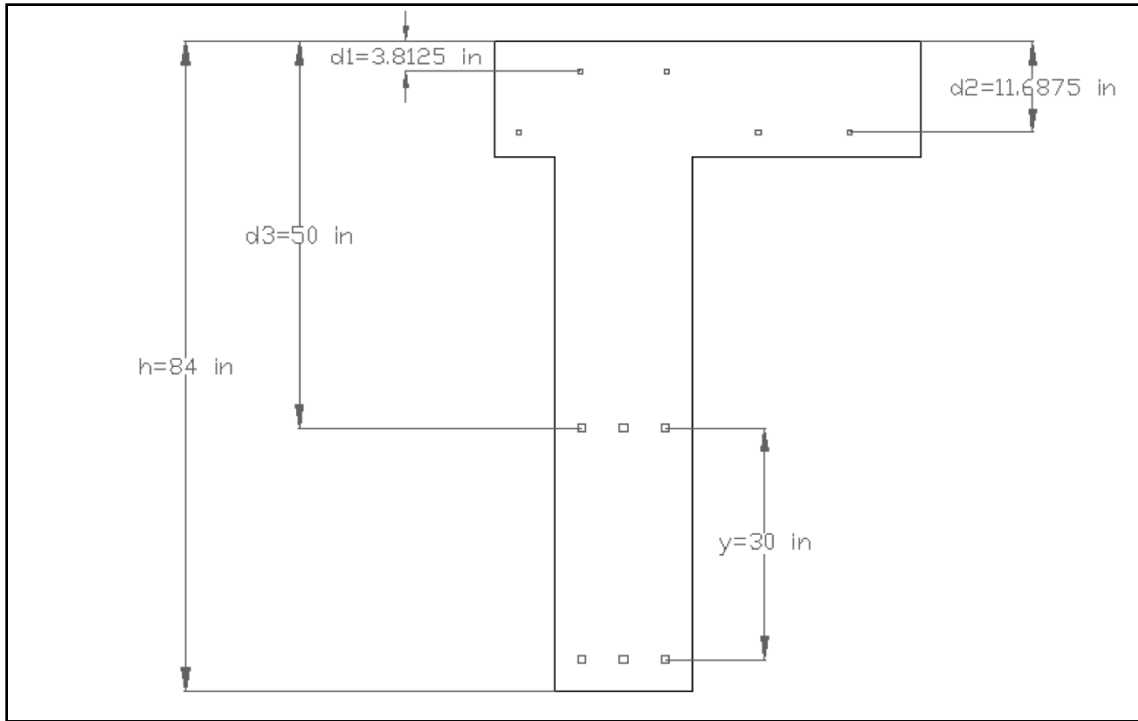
Cross section of the exterior beam at end-span, rebars locations.
